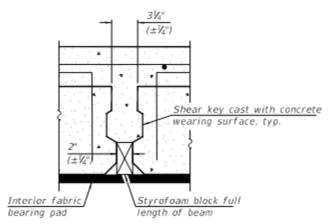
Longitudinal Joint detail A (IDOT, 2017)
